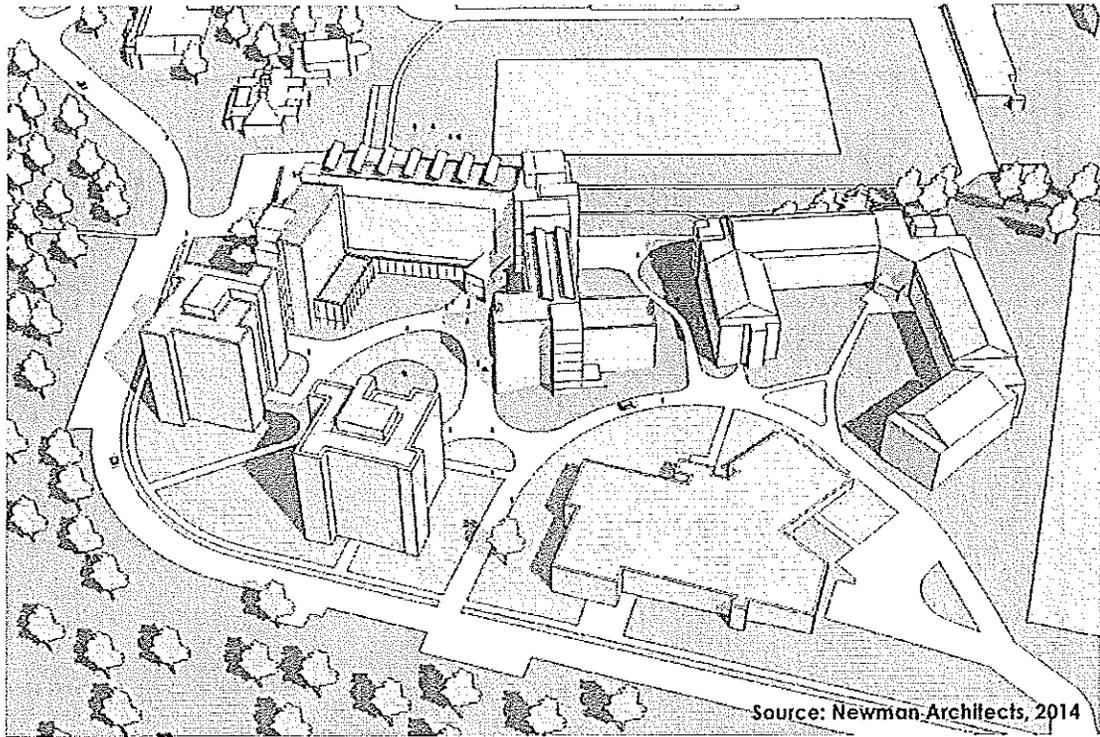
Proposed STEM Residence Hall Architectural Rendering Facing East
